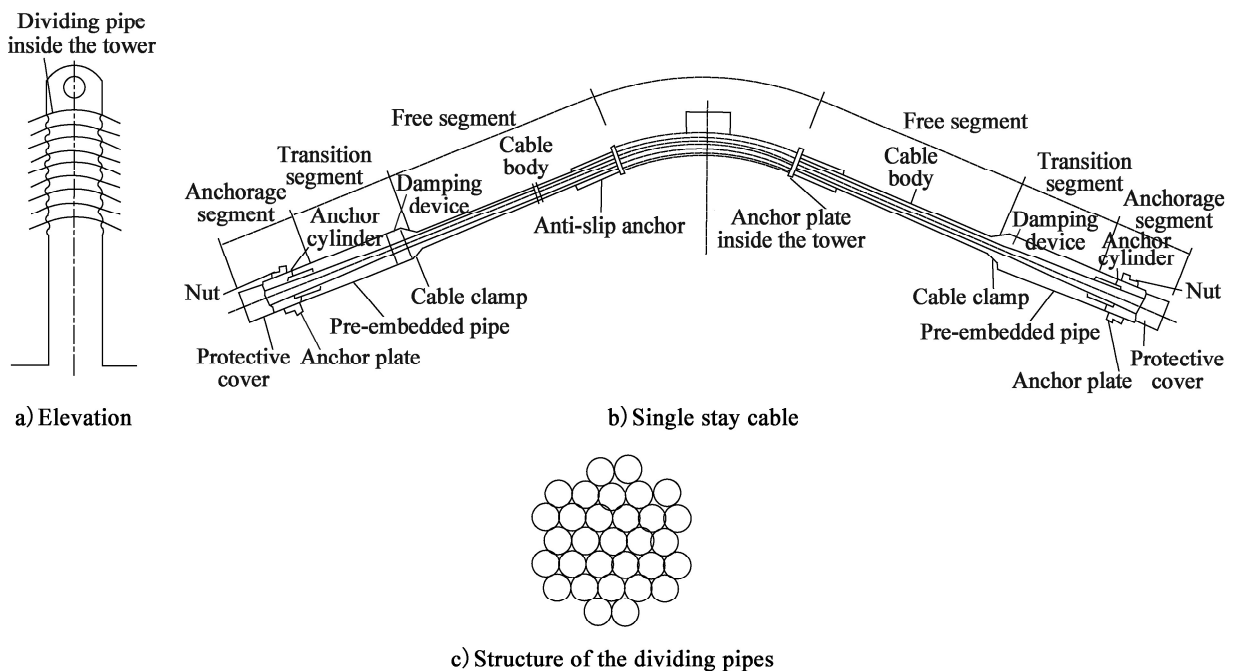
Anchorage on saddle with dividing tubes on concrete tower
